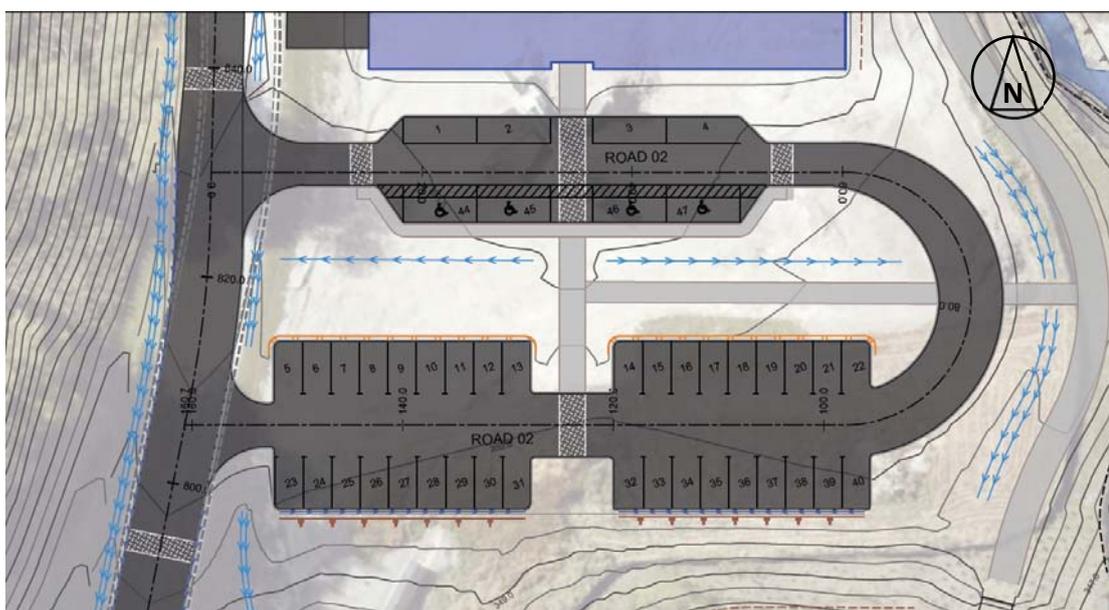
Car Park at Building A (Extract from Paterson Pitts Drawing)
